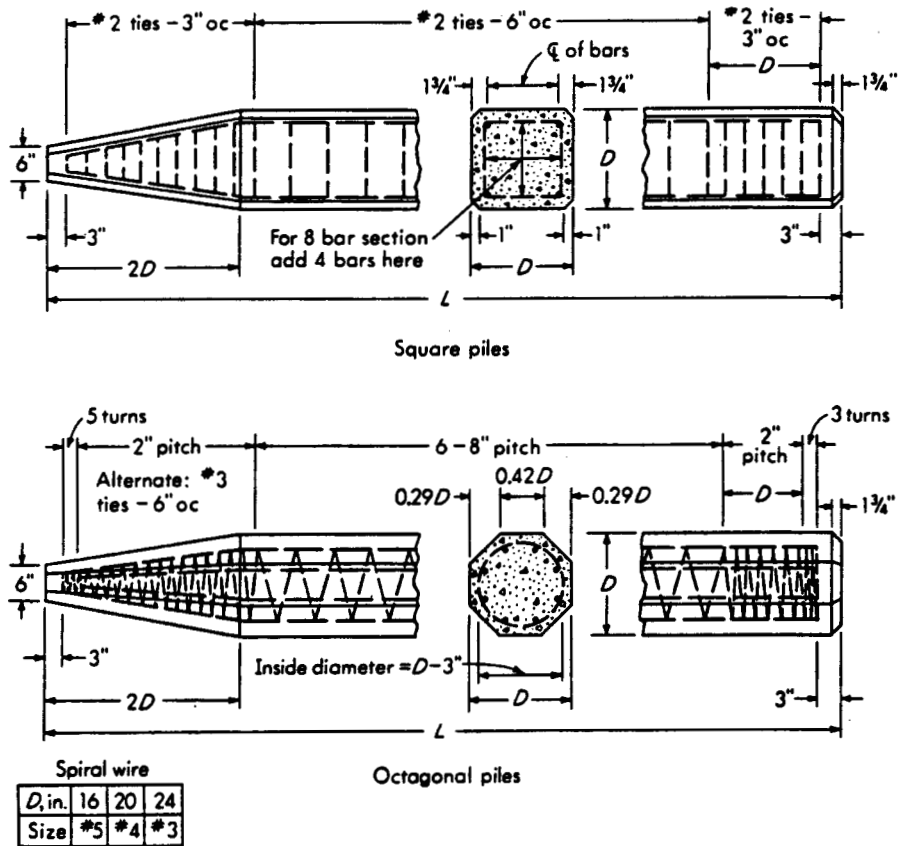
C.3 Typical precast concrete pile. (From Bowles, 1982.)
